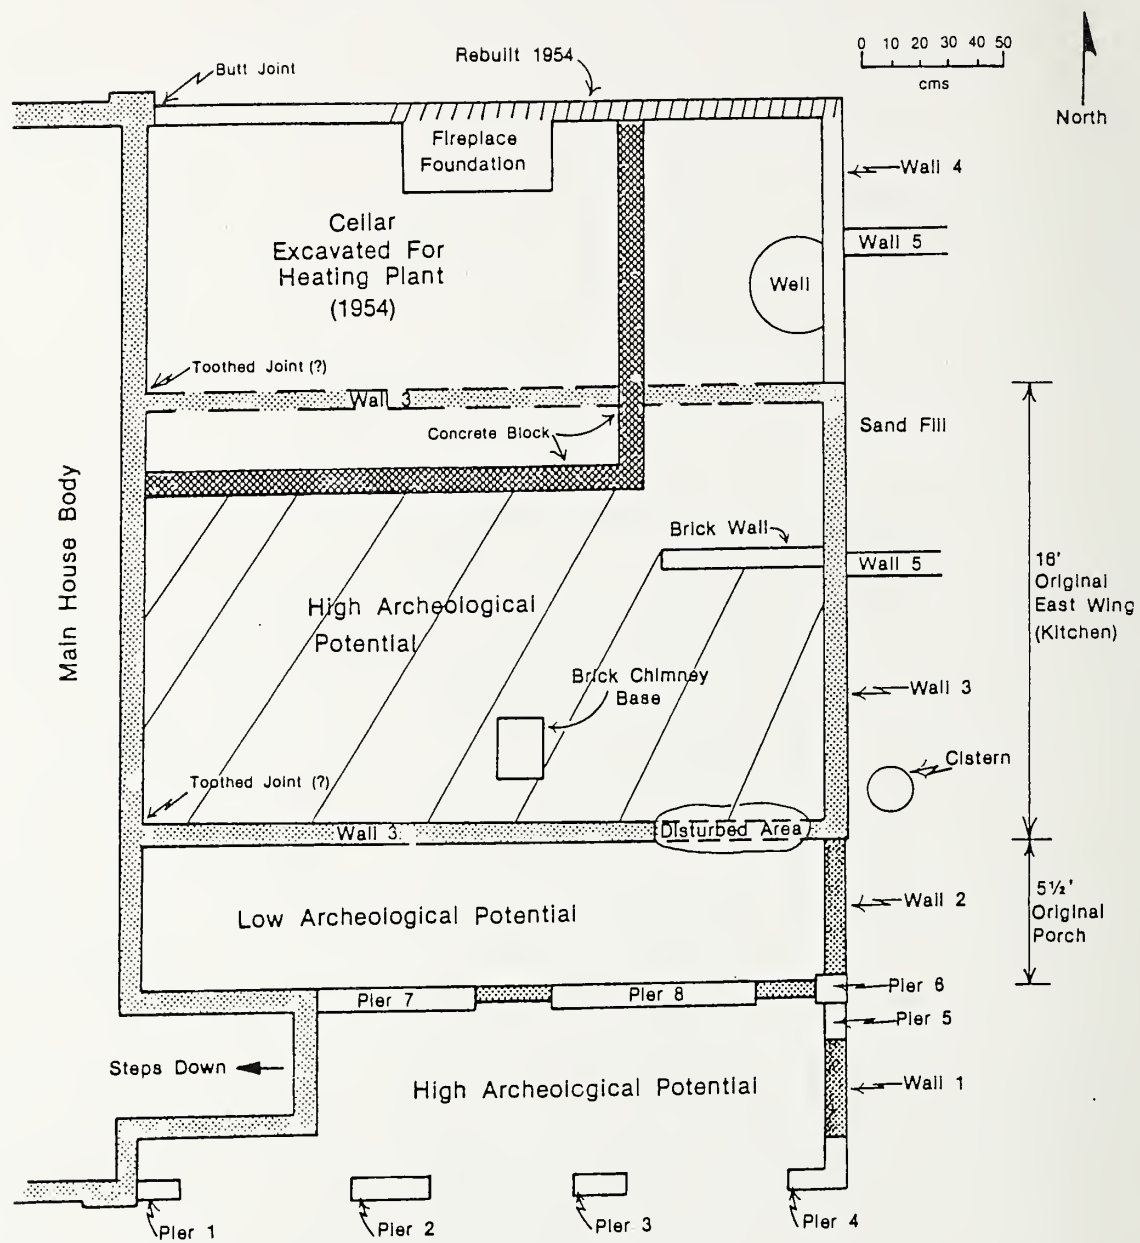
Lincoln Home Back Extension (East Wing); Structural Relationship of Various Walls and Piers.
